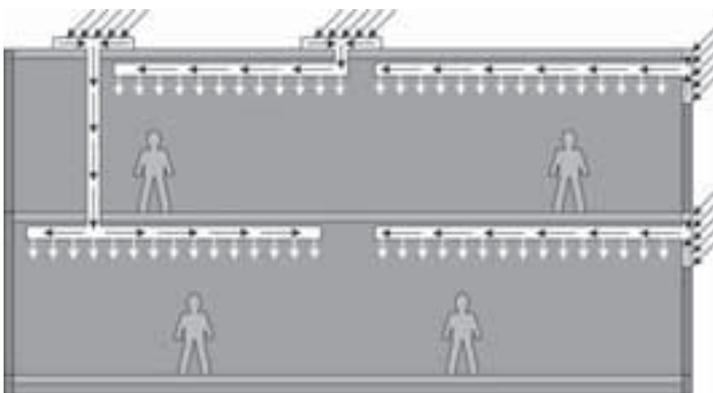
Sunlight is collected on the rooftop or façade and piped inside for lighting.
